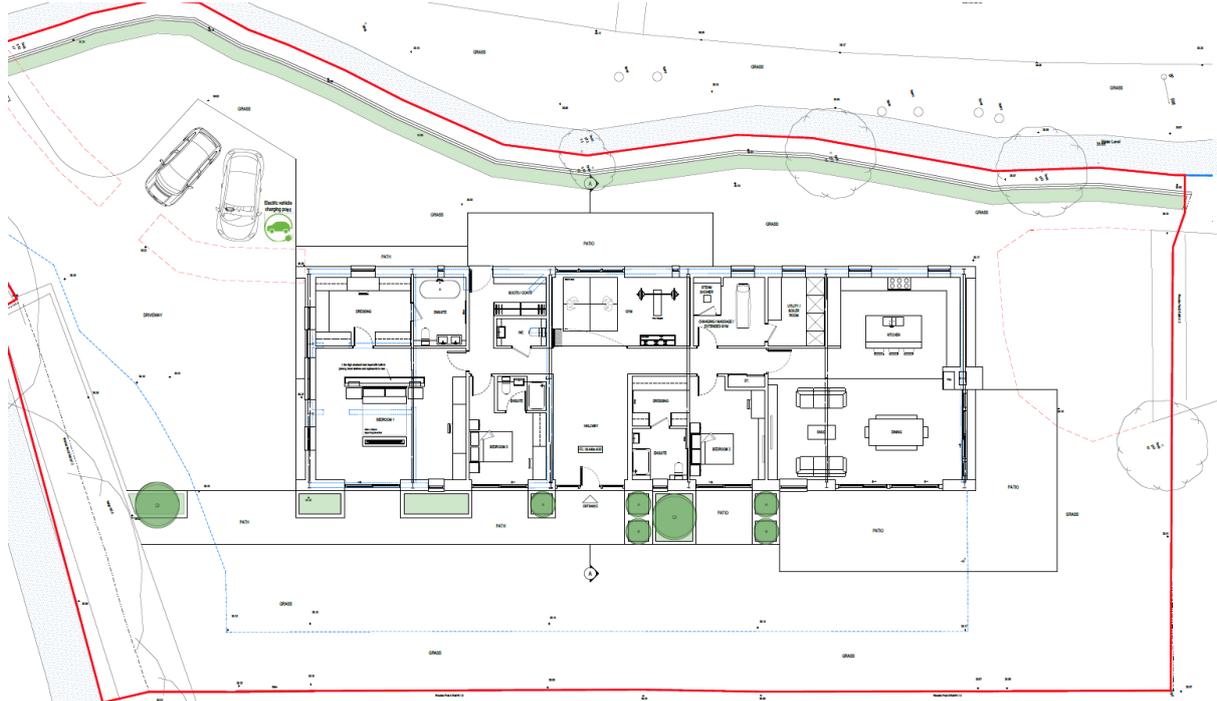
Proposed site layout / ground floor plan for the pre-application scheme
